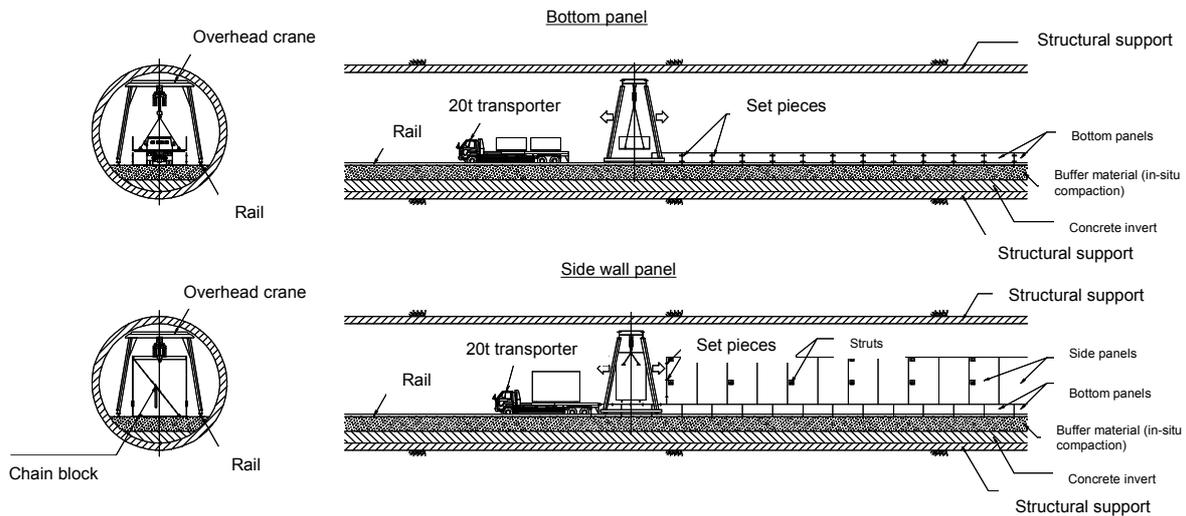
Construction of steel structural framework (circular disposal tunnel, Groups 1 and 2)
